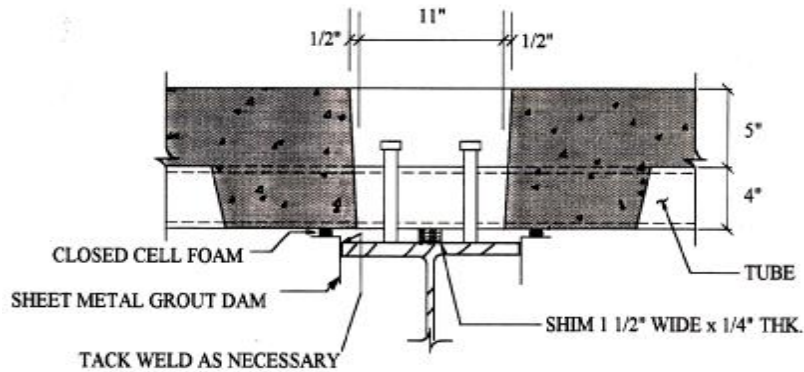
Section C-C of the Effideck system showing girder-to-panel connection
